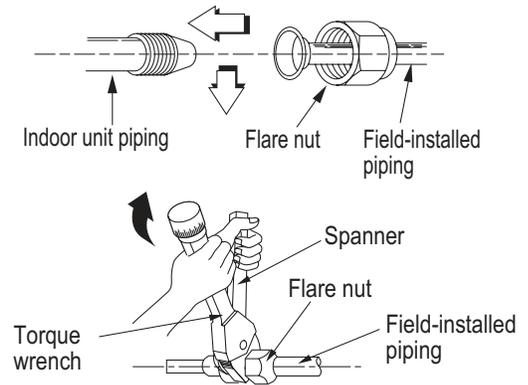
Indoor Unit to Field-Installed Piping Connection.
